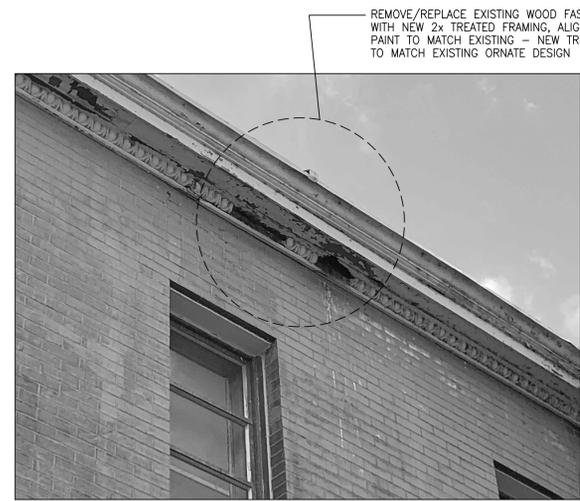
TYPICAL EXISTING TRIM REPAIR/REPLACEMENT
